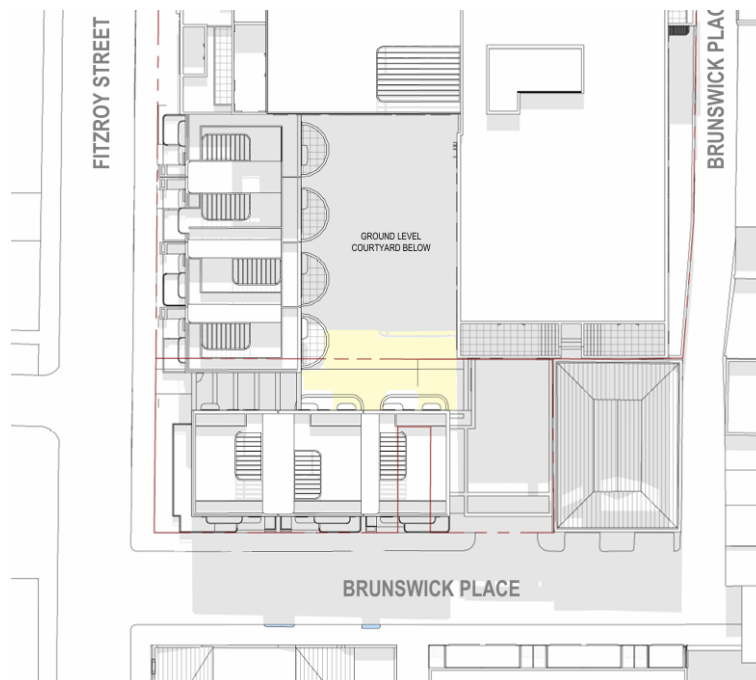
Brunswick Place (south) shadow at 10.15am – Source: Application
